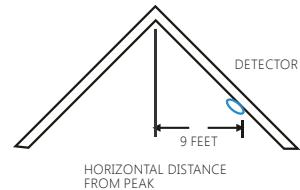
recommended locations to mount smoke detectors in rooms with sloped, gabled, or peaked ceiling
